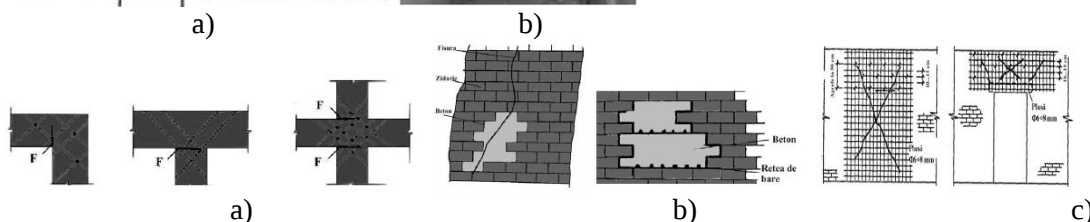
a) Application of reinforced injections to corners / intersections / branches of walls (F - crack); b) concrete filling of masonry cracks; c) local plating with reinforced plaster [97]
